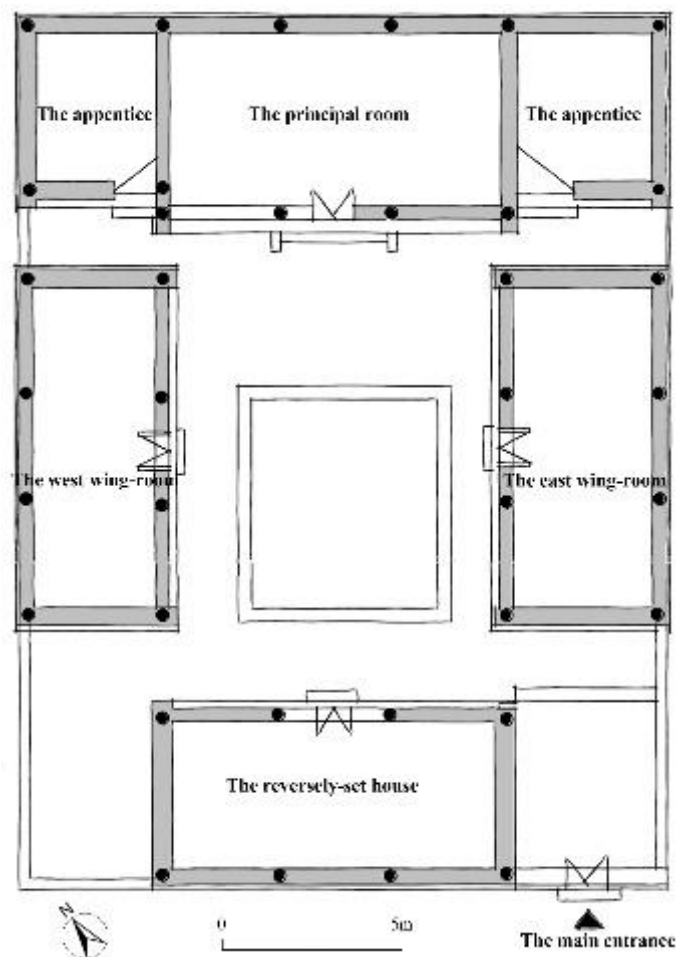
Plan of a courtyard in the old village. Source: Plan by the authors
